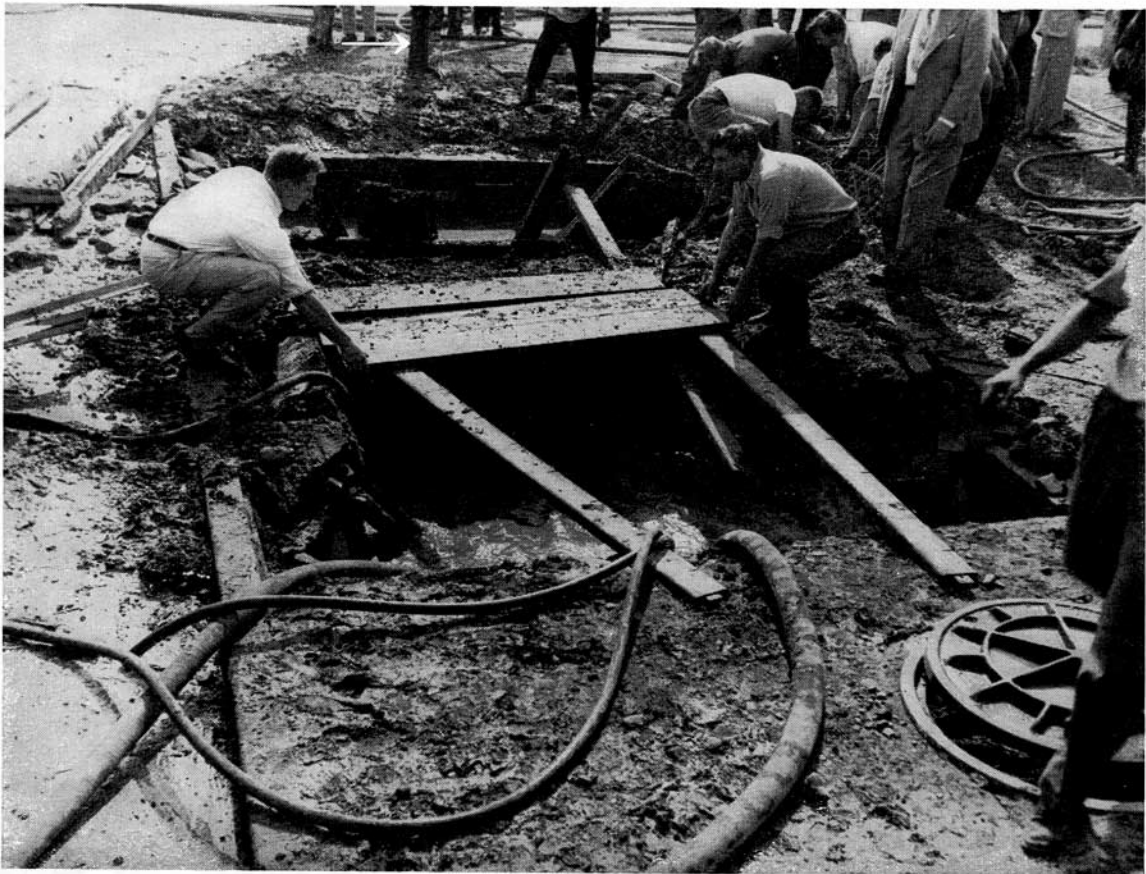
Use of hose lines to flood gas-main drip connections to control gas flow and permit repair work. Note manhole cover over medium-pressure regulator chamber and gauge box pedestal (vent) left of center background (note arrow), beyond low-pressure chamber.
